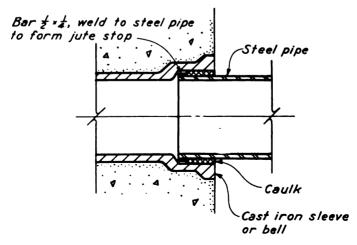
Typical cast iron bell coupling for large pipeline emerging from concrete.
